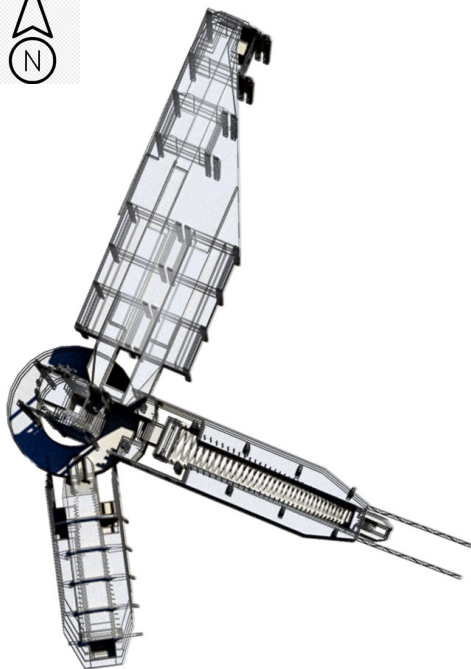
Plan view of Inside-Outside master planning experiment 2.
